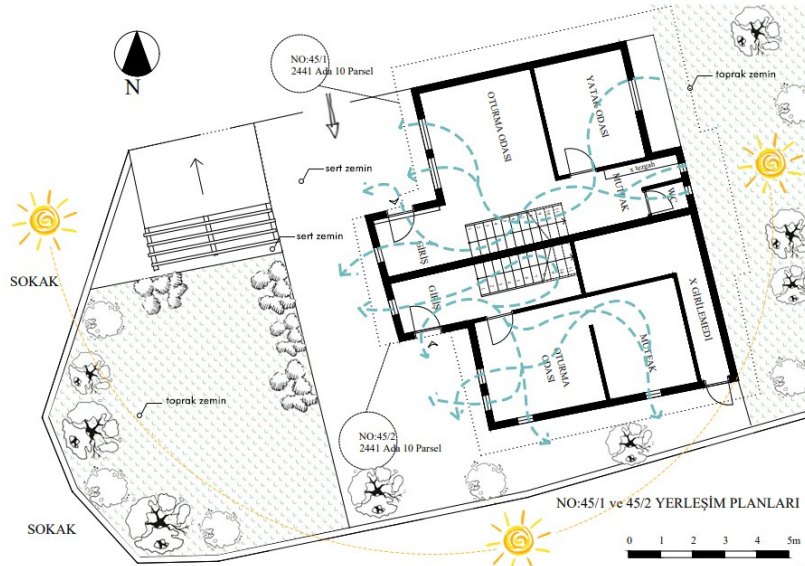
Adjoining Twin Building Example; building form, environment, utilization of sun and wind
